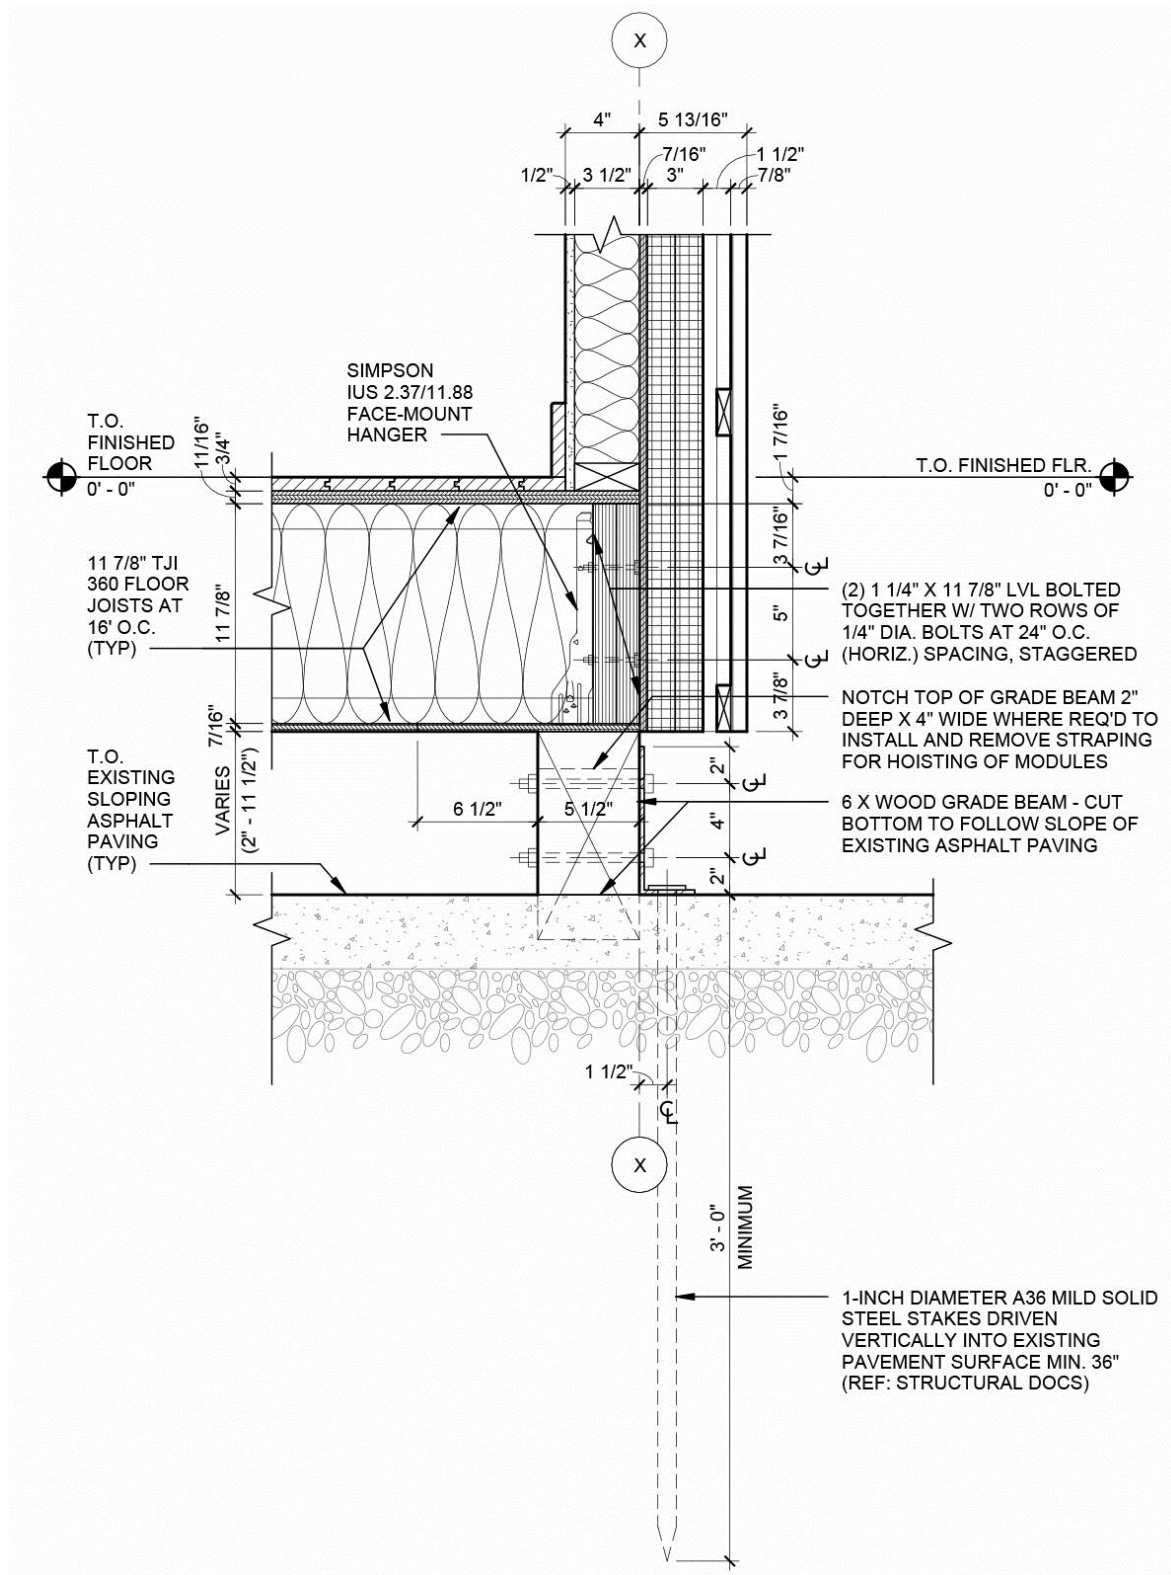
Temporary foundation detail showing grade beams and steel stakes (A5/A-511).
